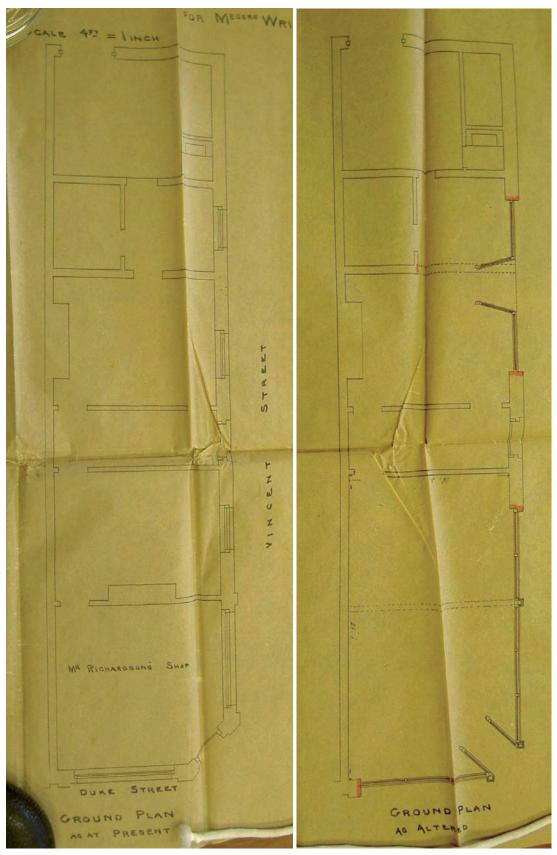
(left) Existing ground floor plan of 79 Duke Street in 1873 (CRO(B) 460 1873)
